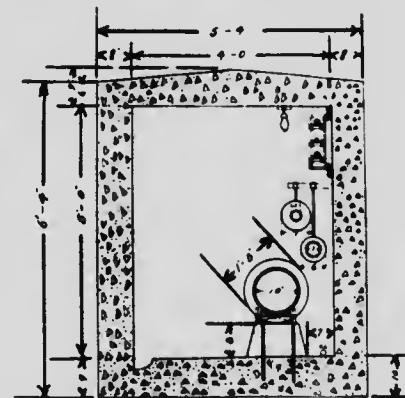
SECTION OF TUNNEL CONNECTING KNOX COLLEGE WITH CONVOCATION HALL.
